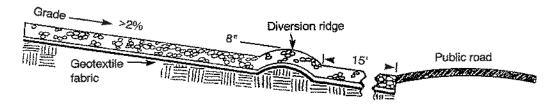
Cross-section of a Construction Entrance/Exit (NC, 1993)
